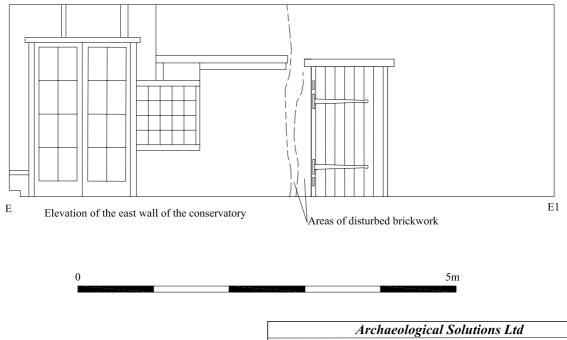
Detailed plans and elevations Scale 1:50 at A4
